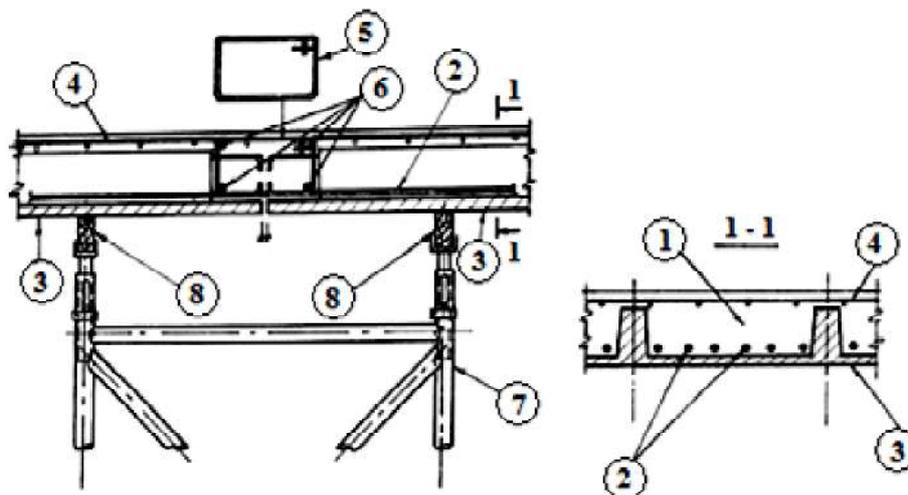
Support scheme for the panels of precast concrete formwork in the middle of the span. A part of the monolithic formwork and reinforcement example (see Fig. 2 for the position of the grid):
